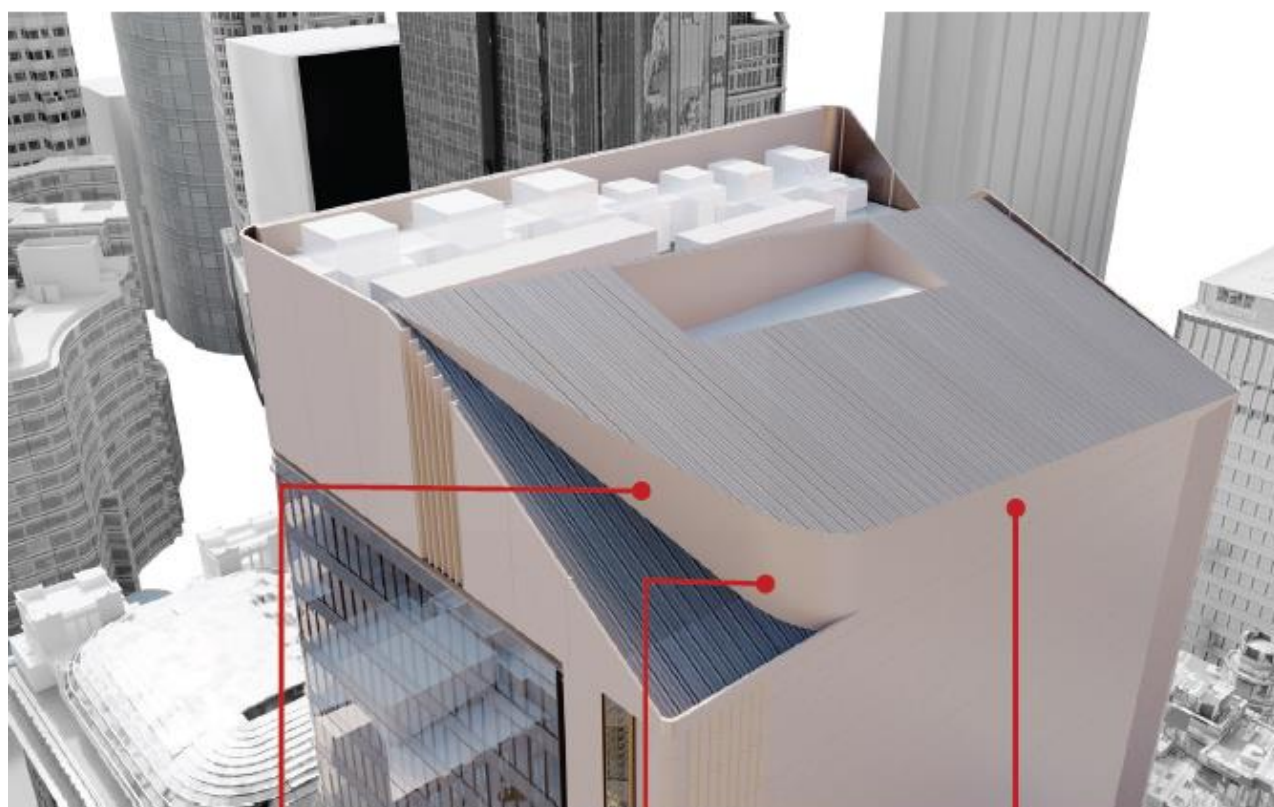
Revised southern facade and south eastern building corner as viewed from Elizabeth Street
